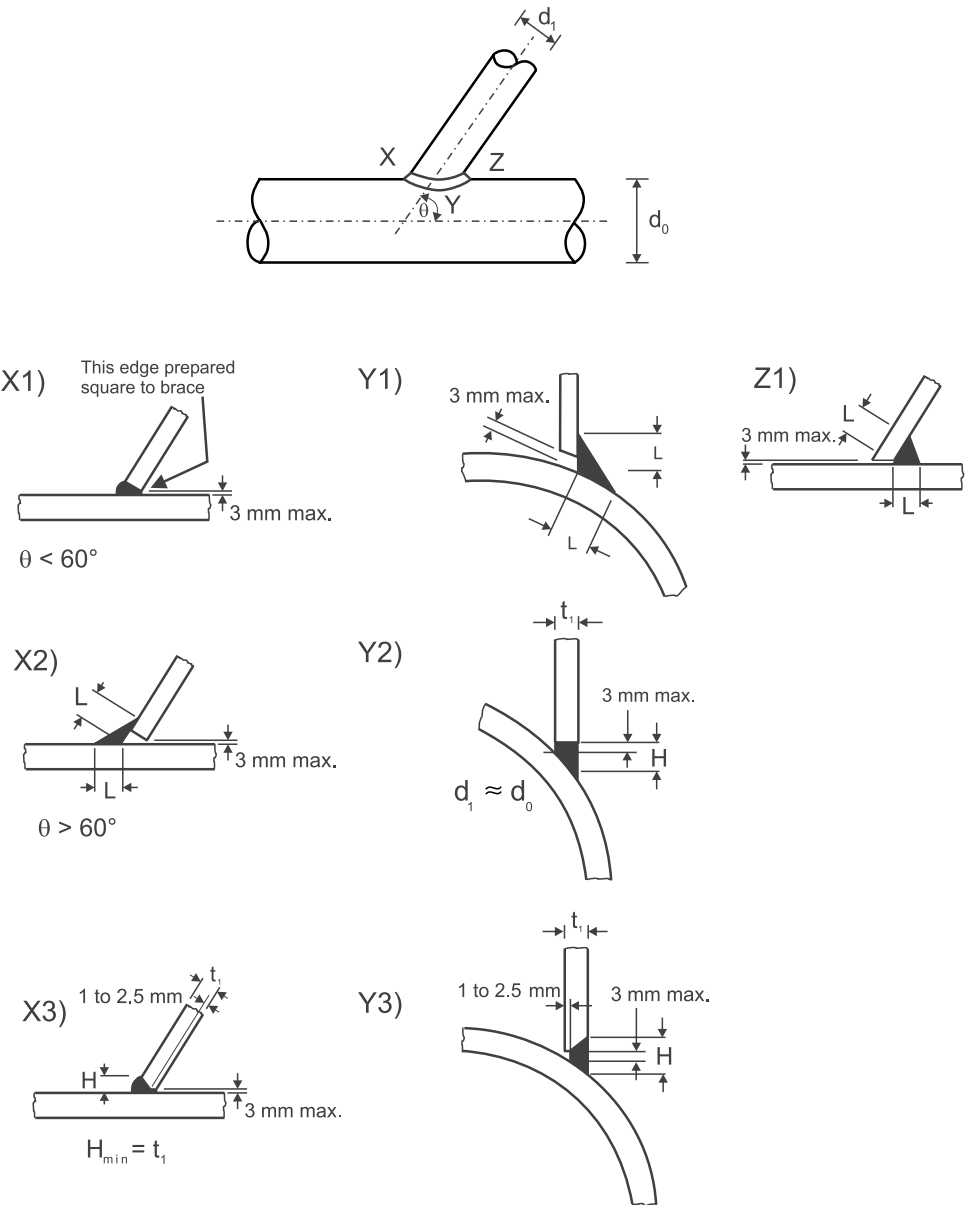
Fillet and butt (groove) welds in lattice joints between circular hollow sections
